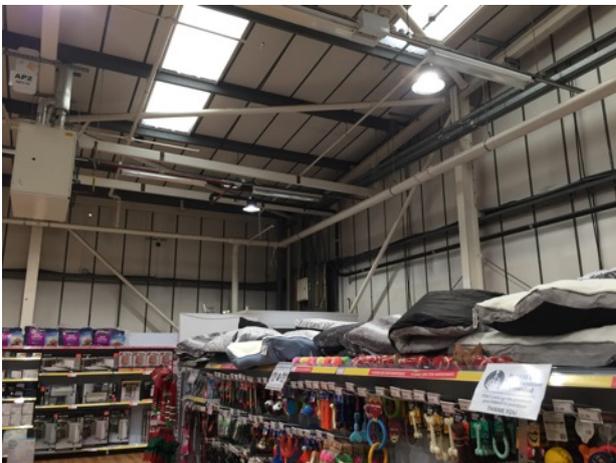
Interior view of the north-western corner of the existing Poundstretcher retail store, showing the steel-framed construction.
